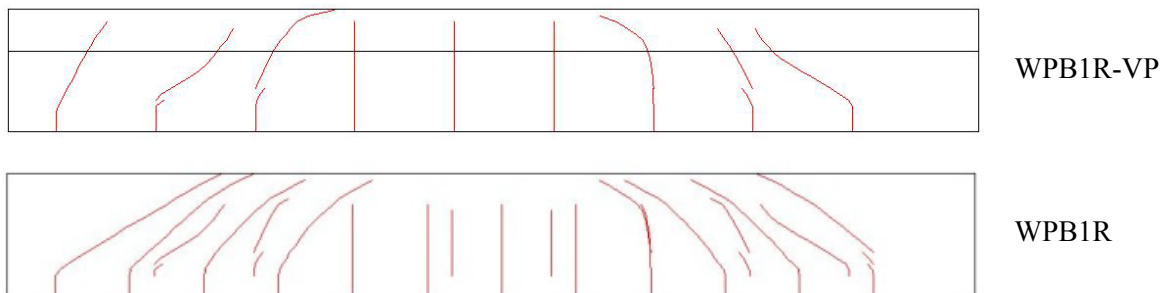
Cracking pattern of beams WPB1R-VP and VPB1R at failure load
